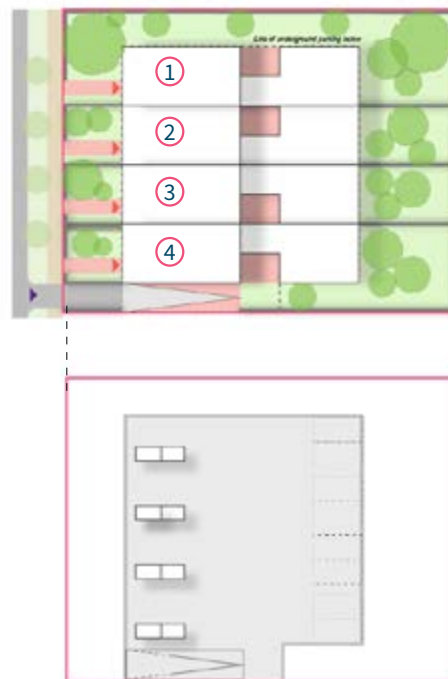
Terraces with underground parking from primary street. Minimises the negative impact of parking on each dwelling and on the streetscape.
